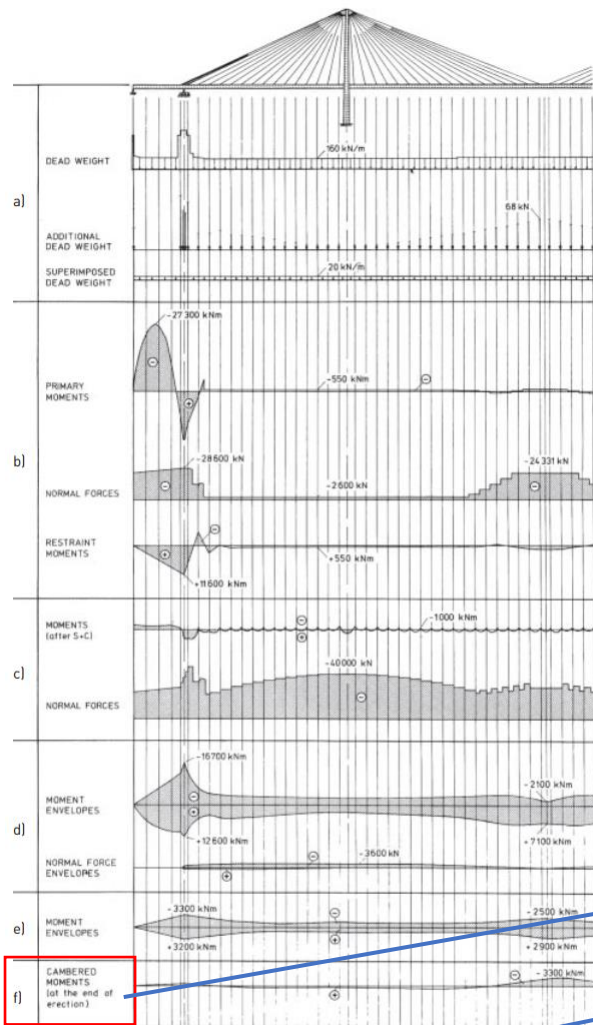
Typical loads and action forces of a cable-stayed concrete bridge (Pasco-Kennewick Bridge)
